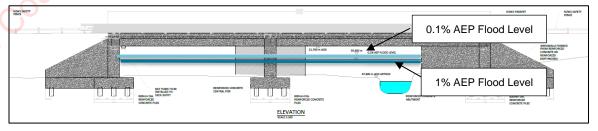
Post-development Flood Levels for Road Bridge 1
